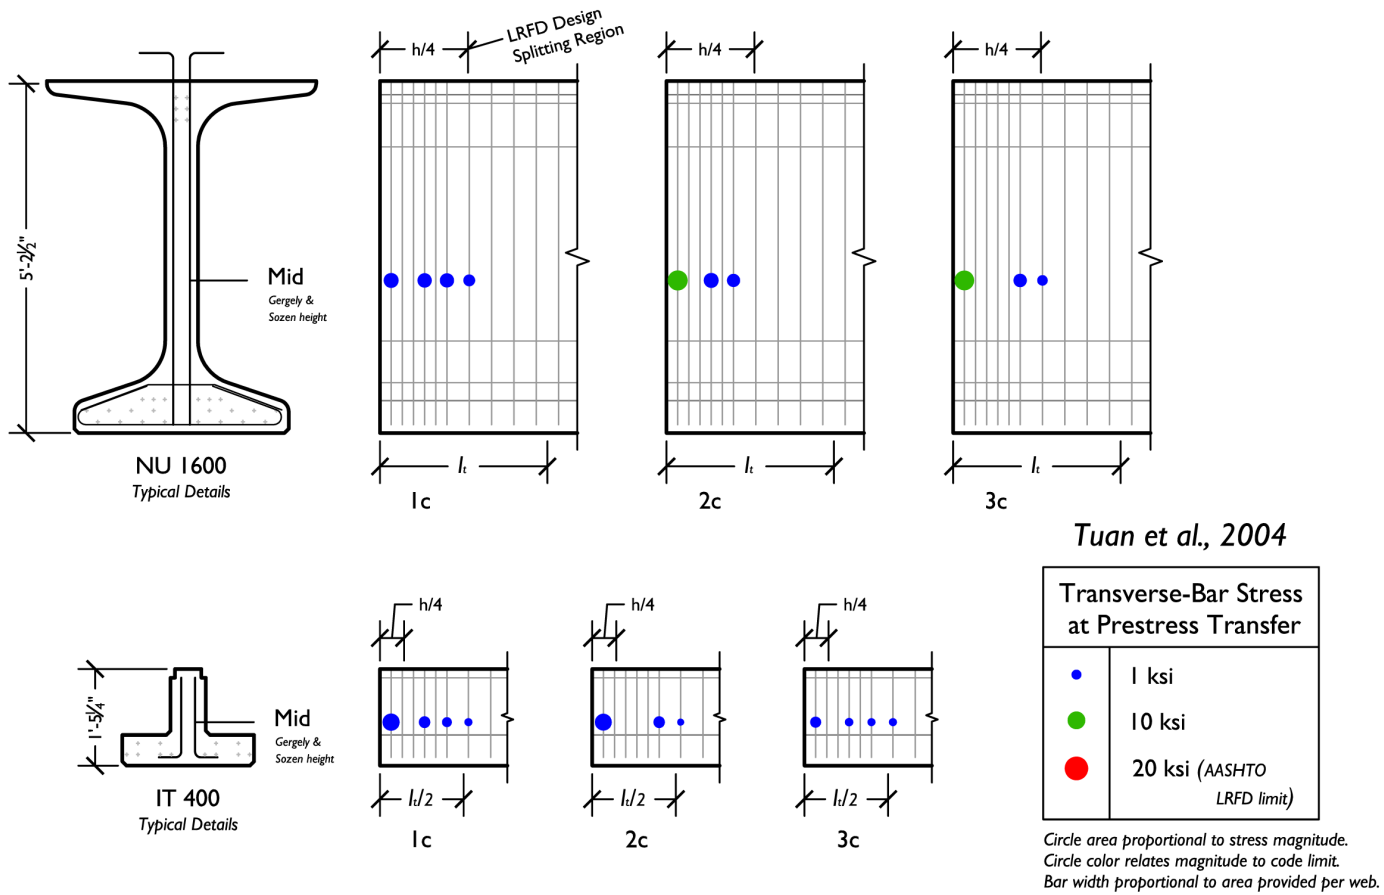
Nebraska bulb tees and inverted tees (NU and IT girders), typical reinforcing details
